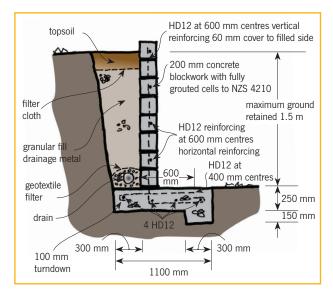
Concrete masonry retaining wall for non-cohesive granular soil.
